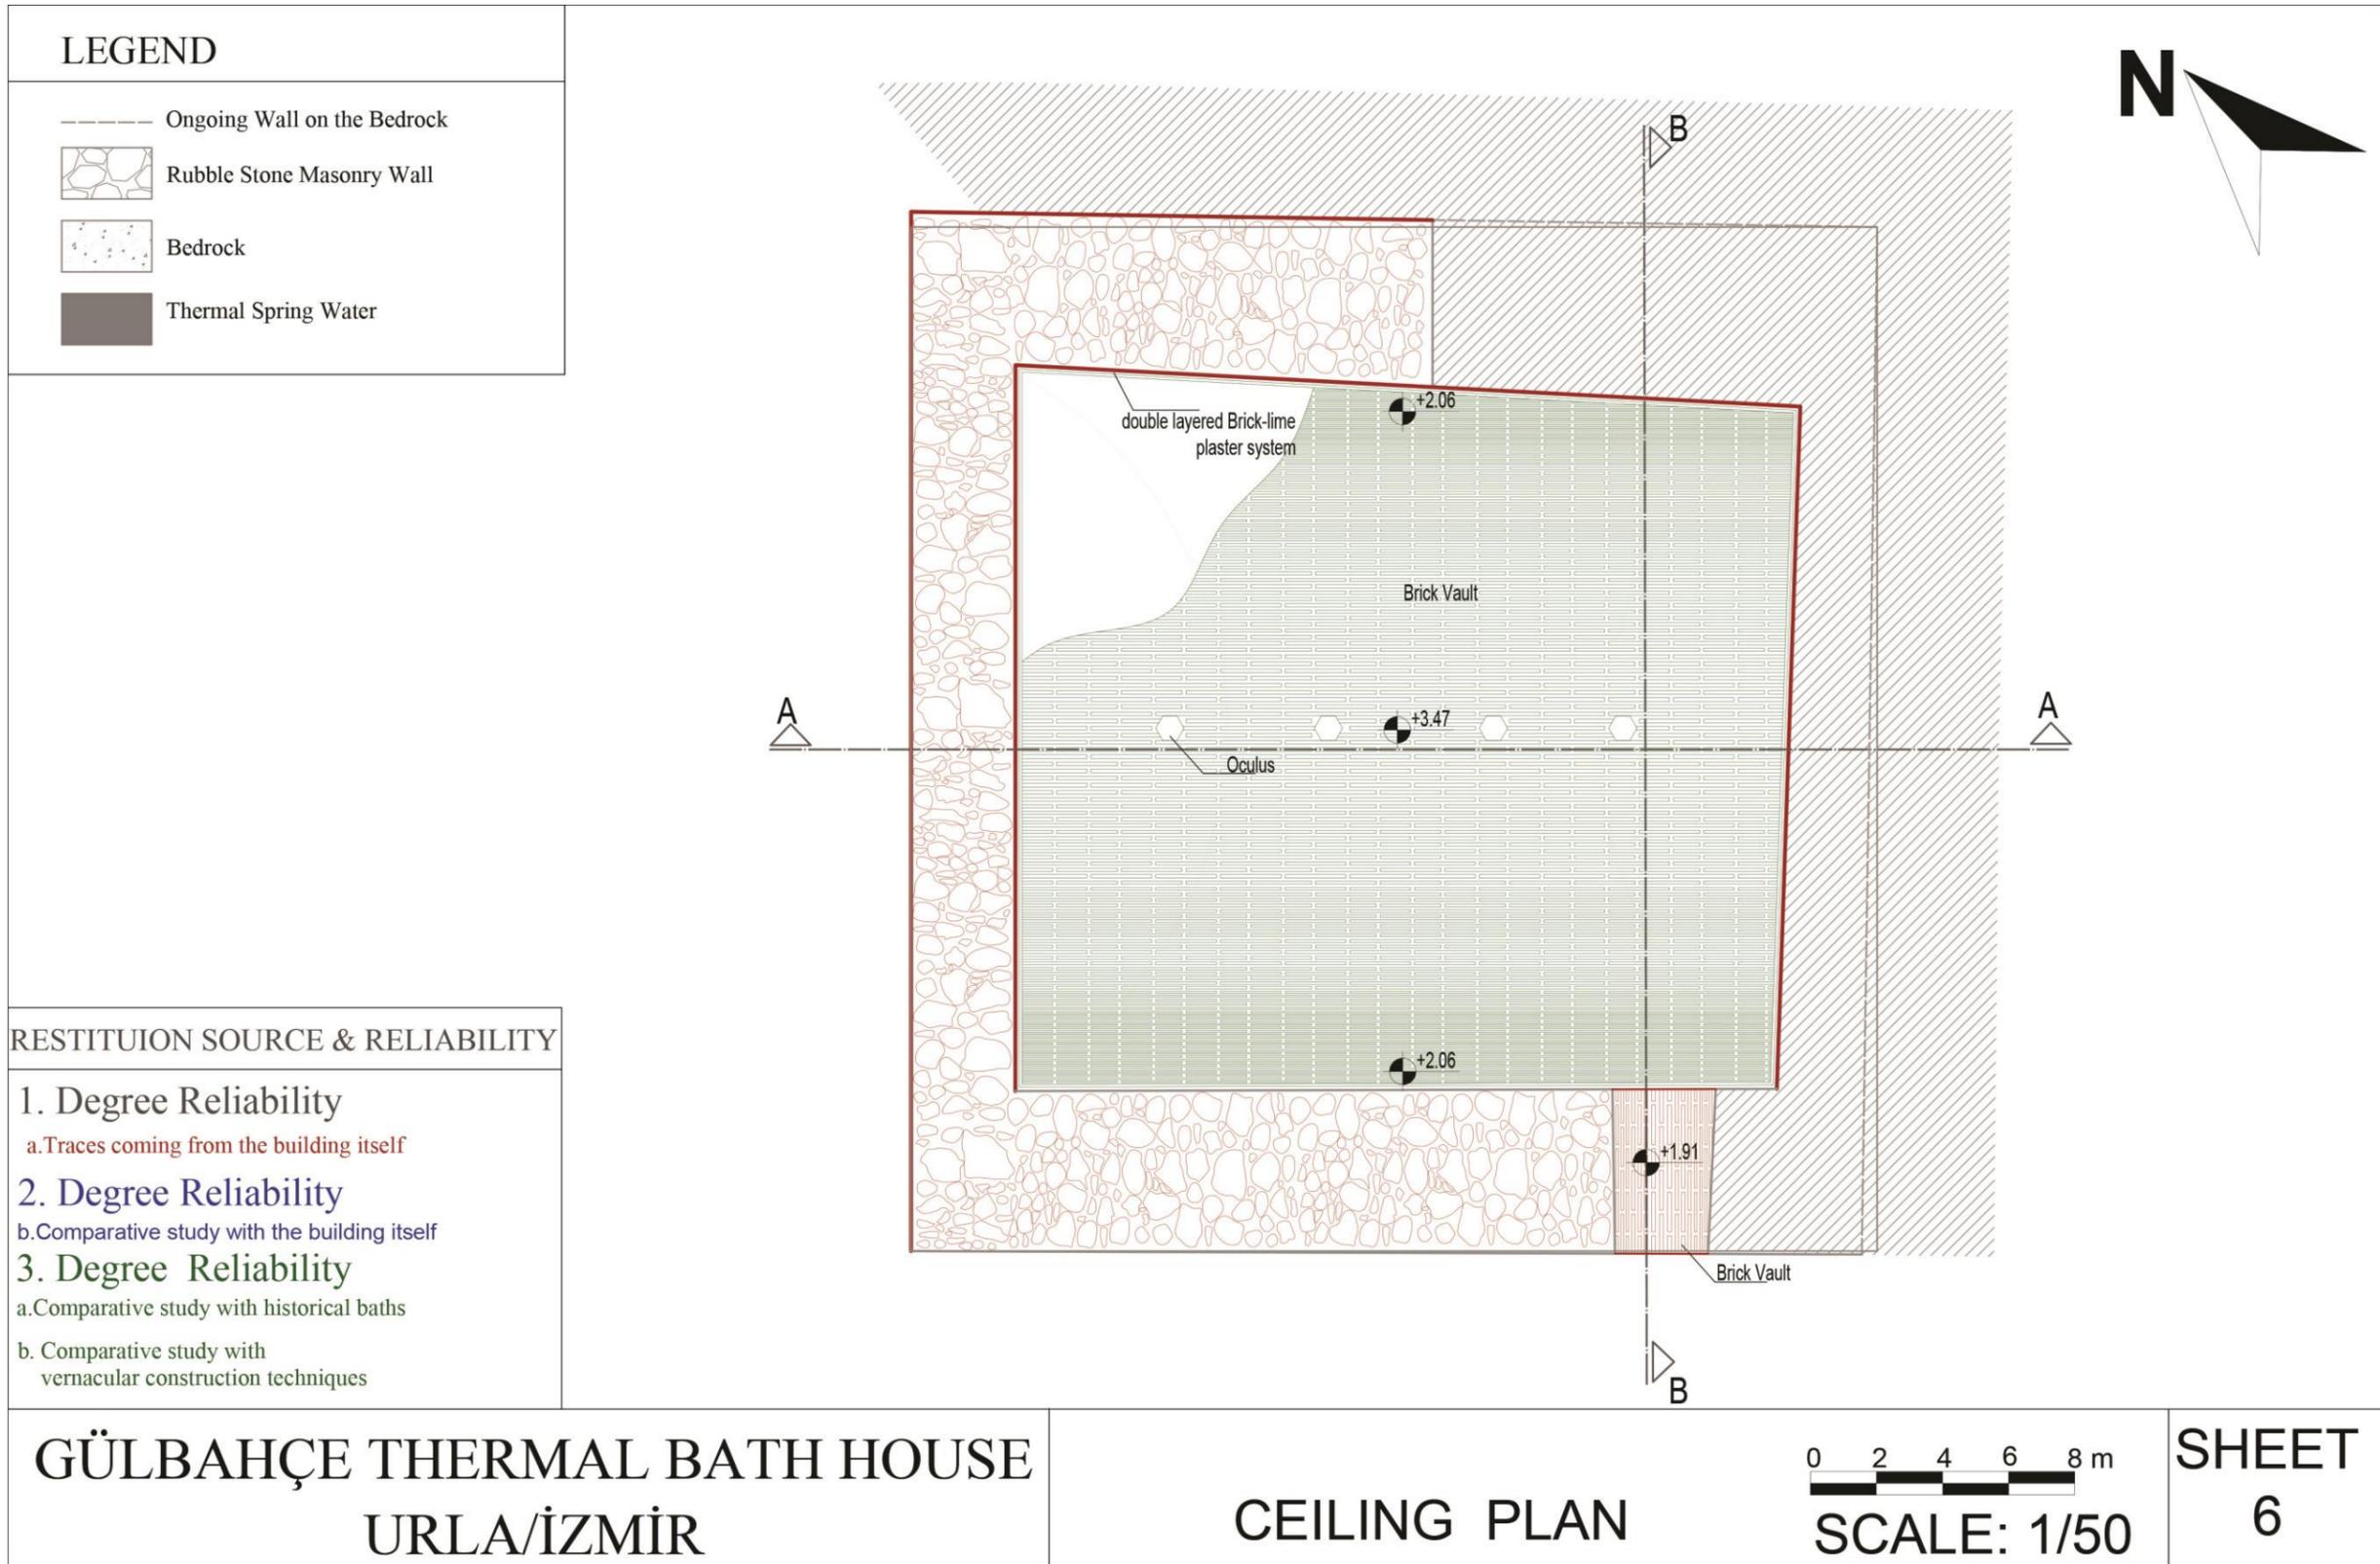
Ceiling Plan-Restitution (Source: İYTE,2019)
